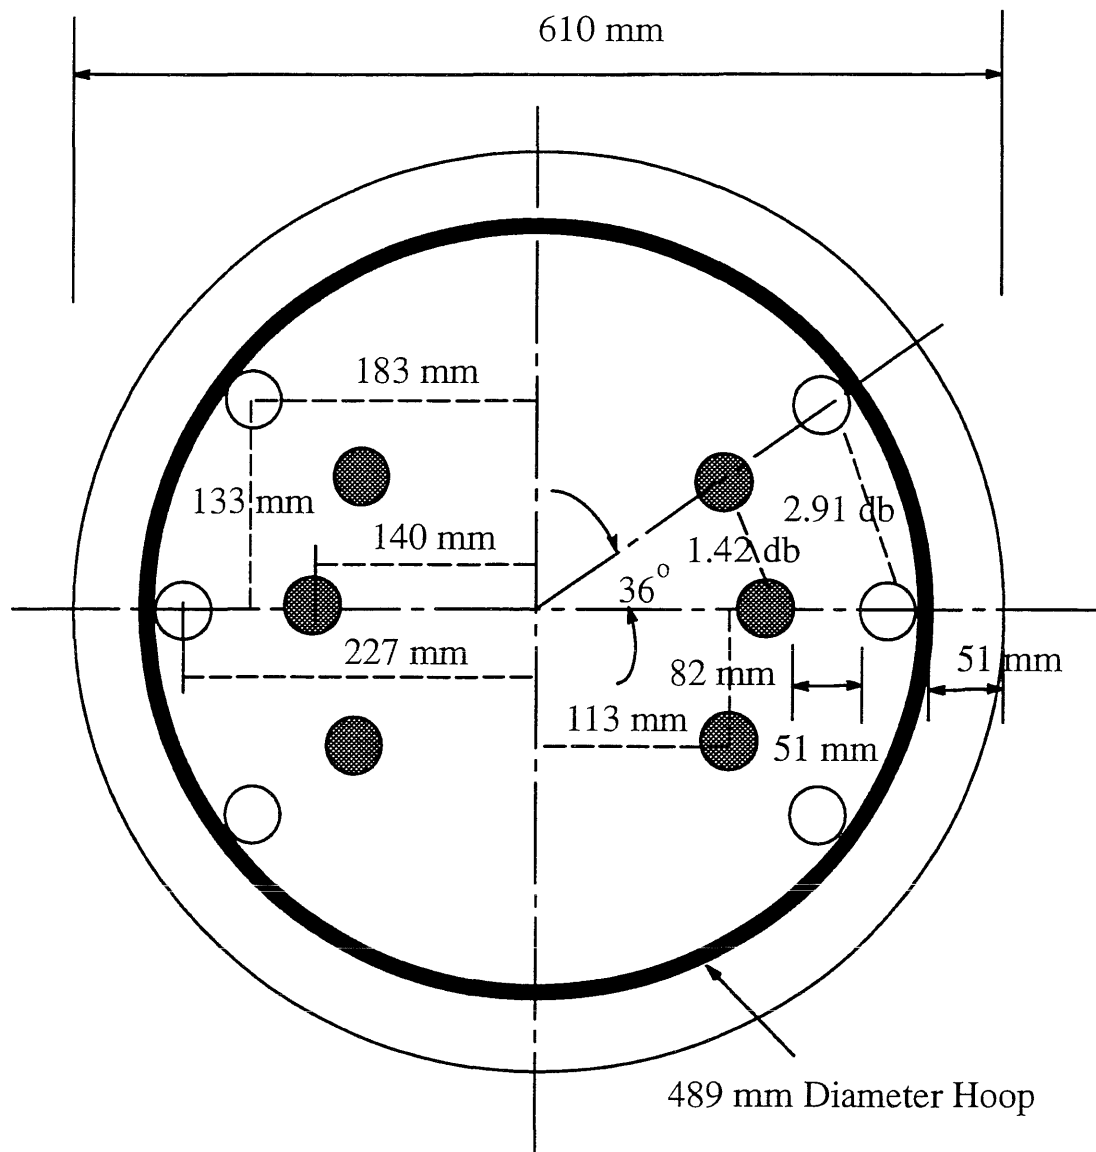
Cross Section for Column A-3 (L=C=51 mm)
